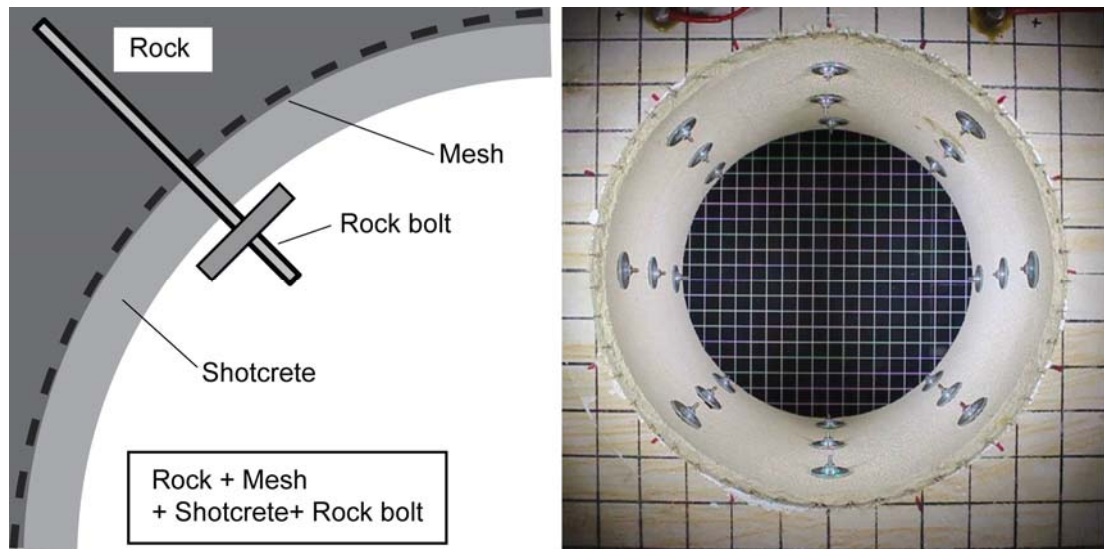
Ground scheme consisting of mesh, shotcrete and rock bolt application.
